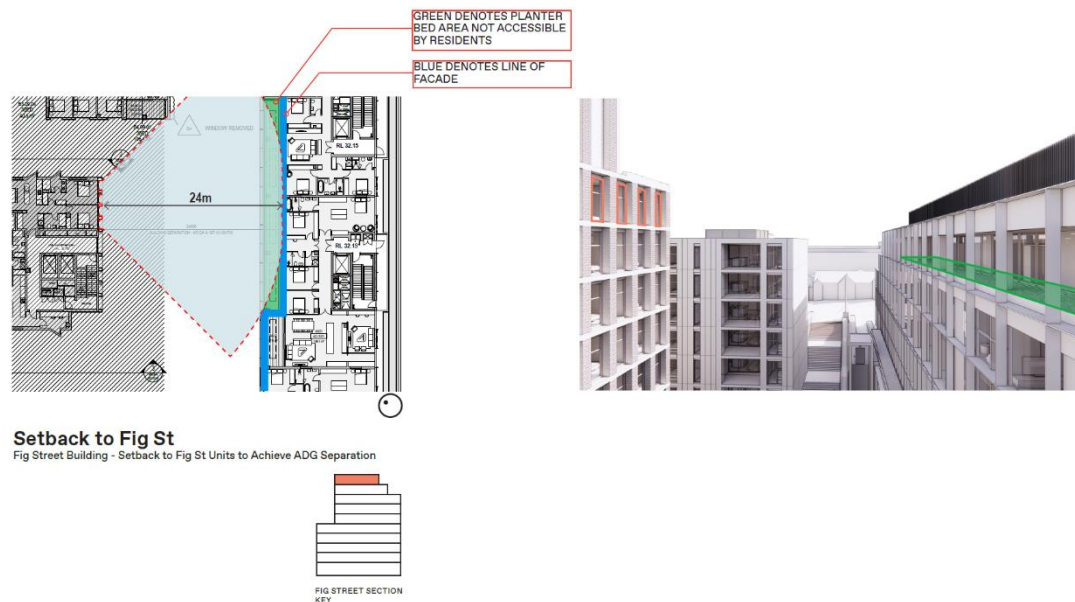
Privacy protection measures - Non-accessible planter: Fig Street Building to Courtyard Building
